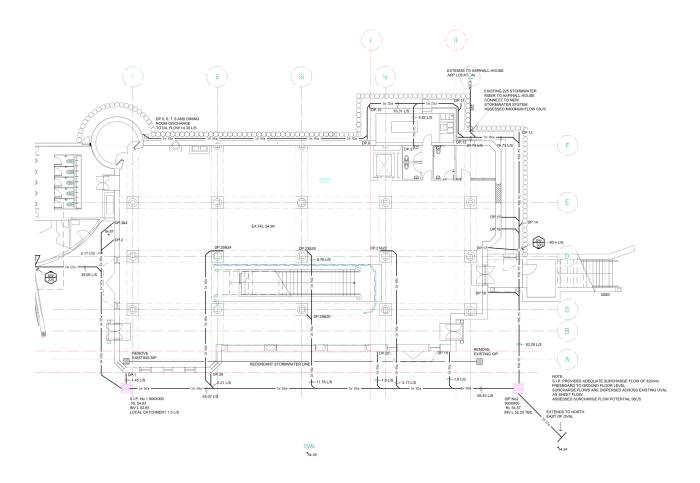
JCL Existing Aspinal House Stormwater System Diagram dated 14 March 2018
